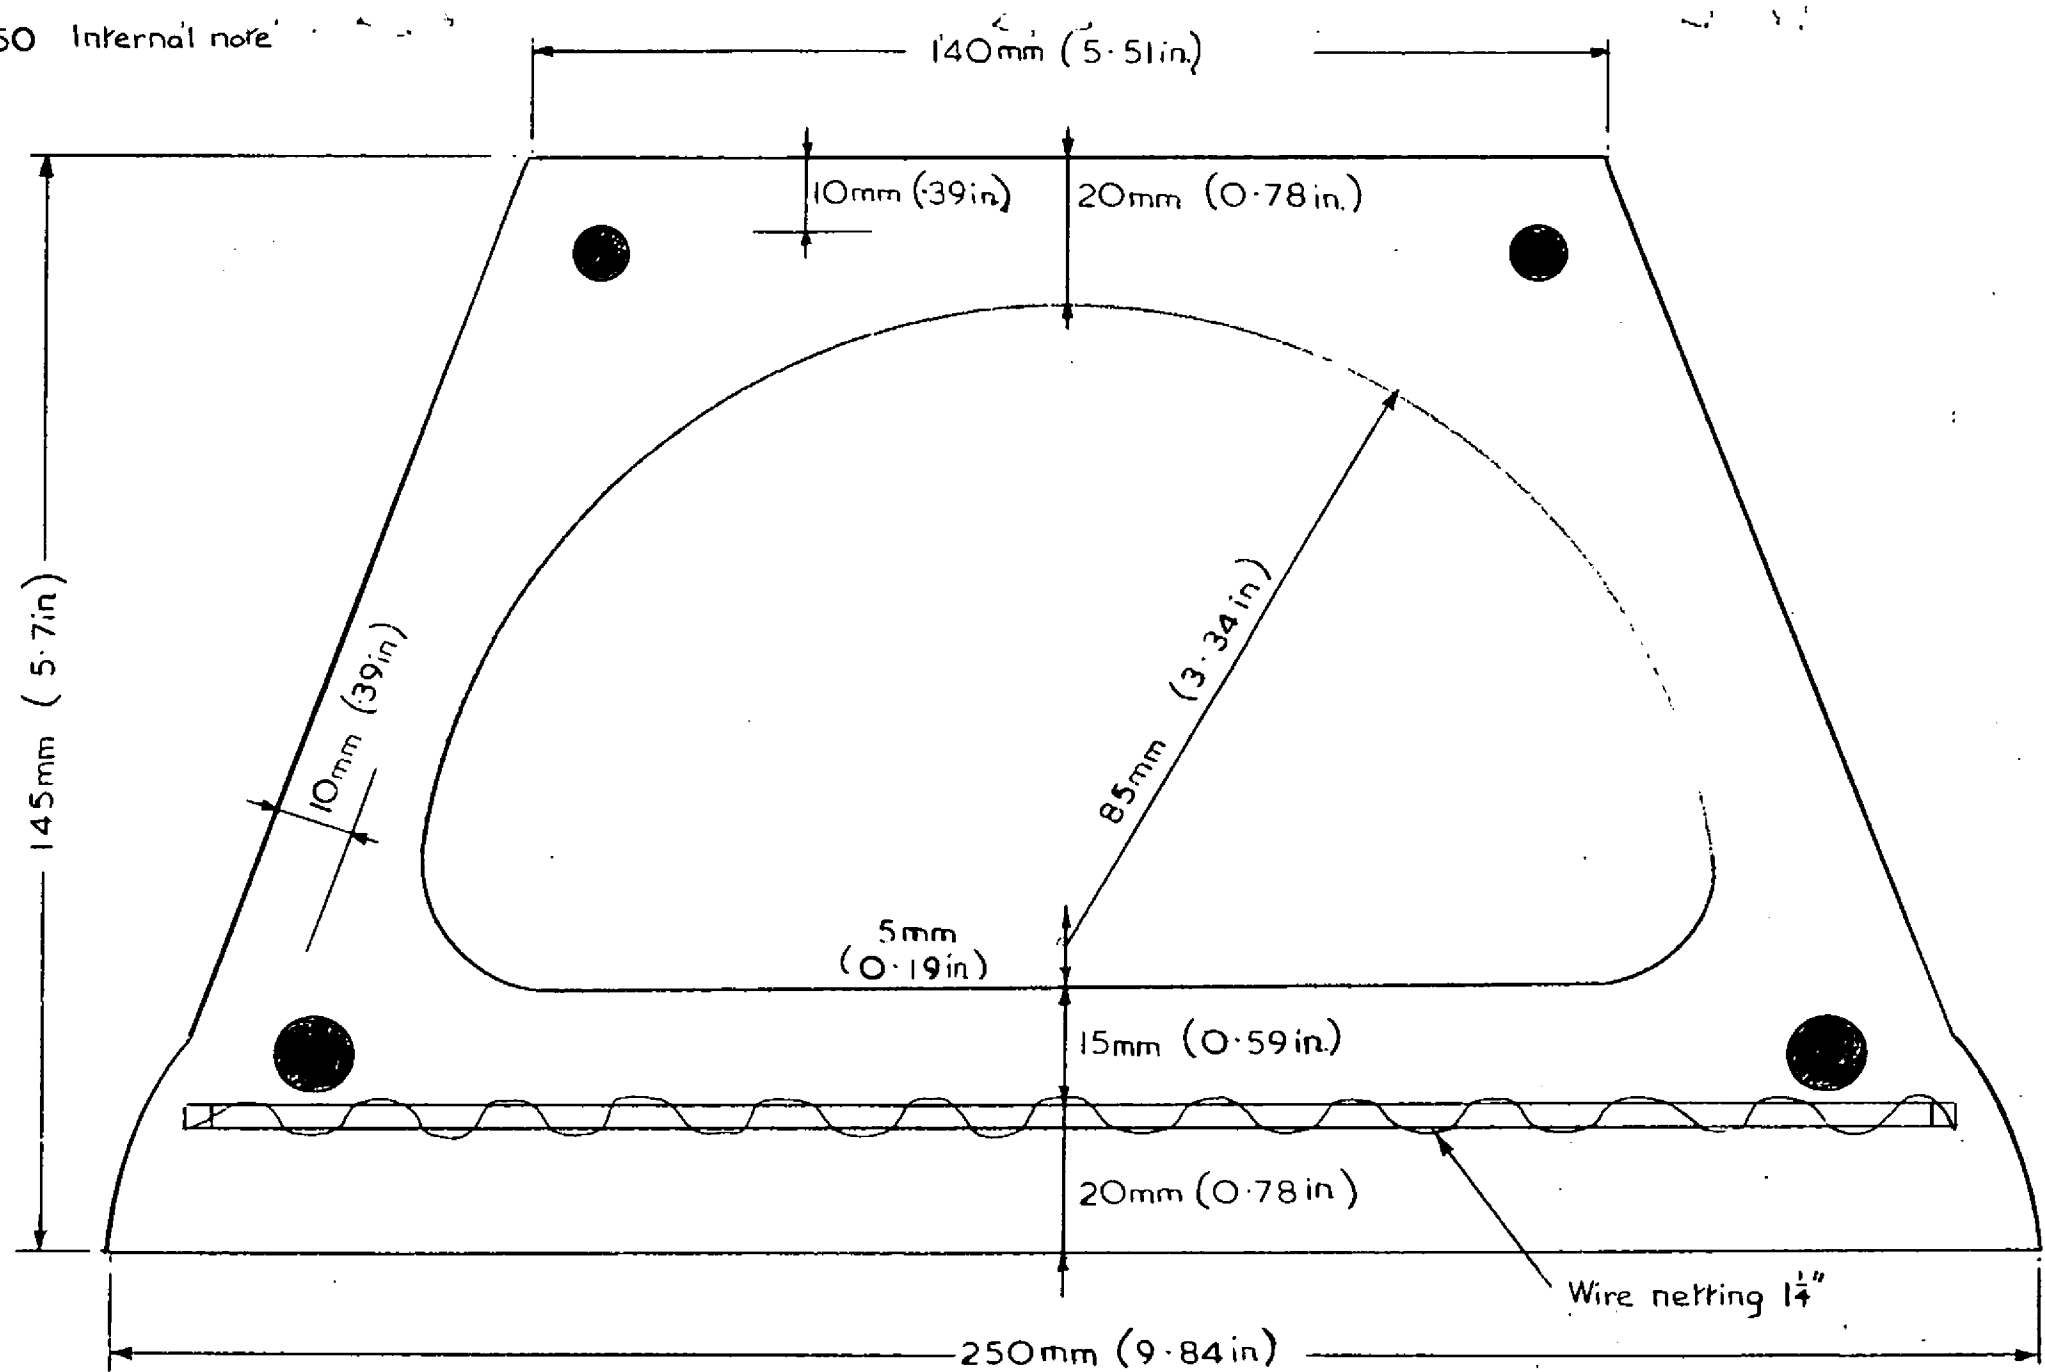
CROSS-SECTION OF PRECAST HOLLOW REINFORCED CONCRETE BEAMS
